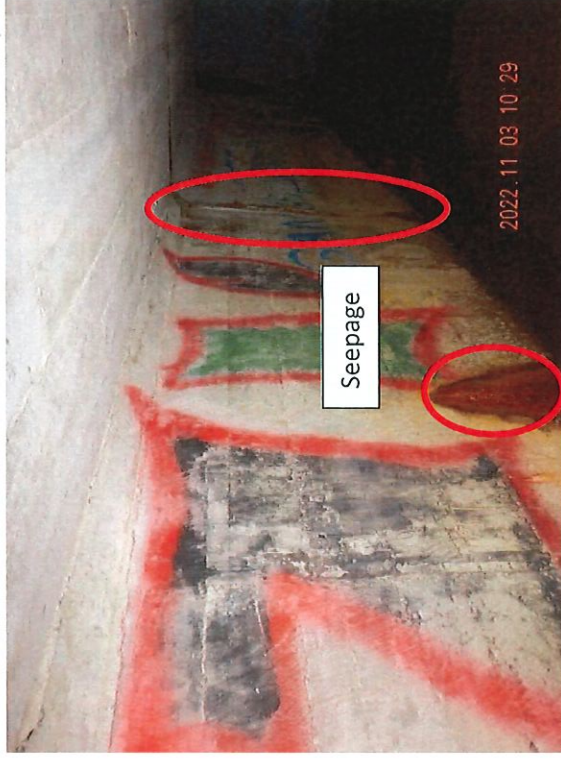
description: Seepage Point Right Box Spillway (Right Side)
